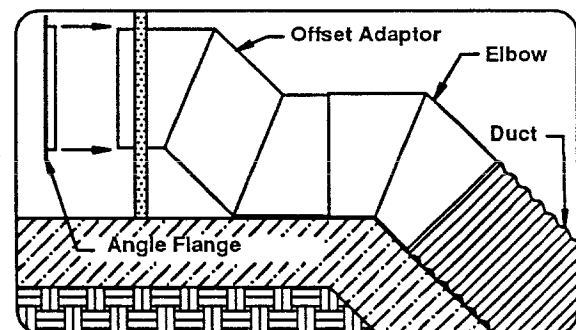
Offset Elbow Adaptor and Elbow Adaptor Placement
